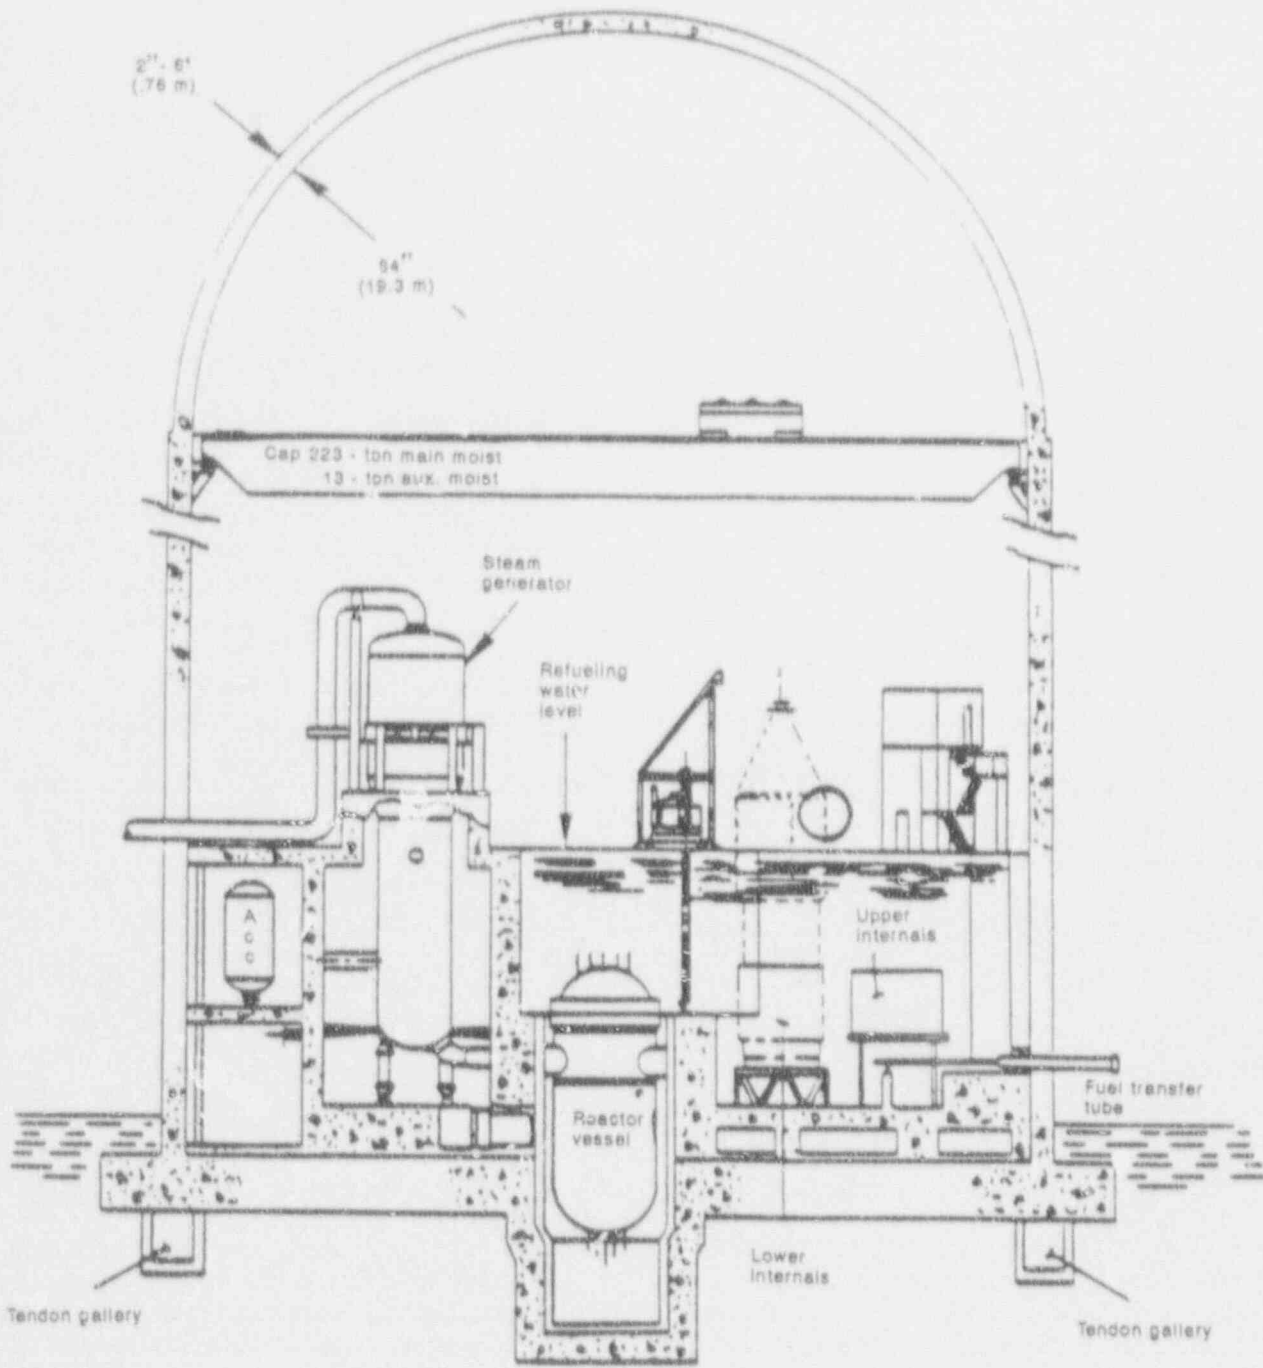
Containment elevation view of a Westinghouse PWR.⁹
